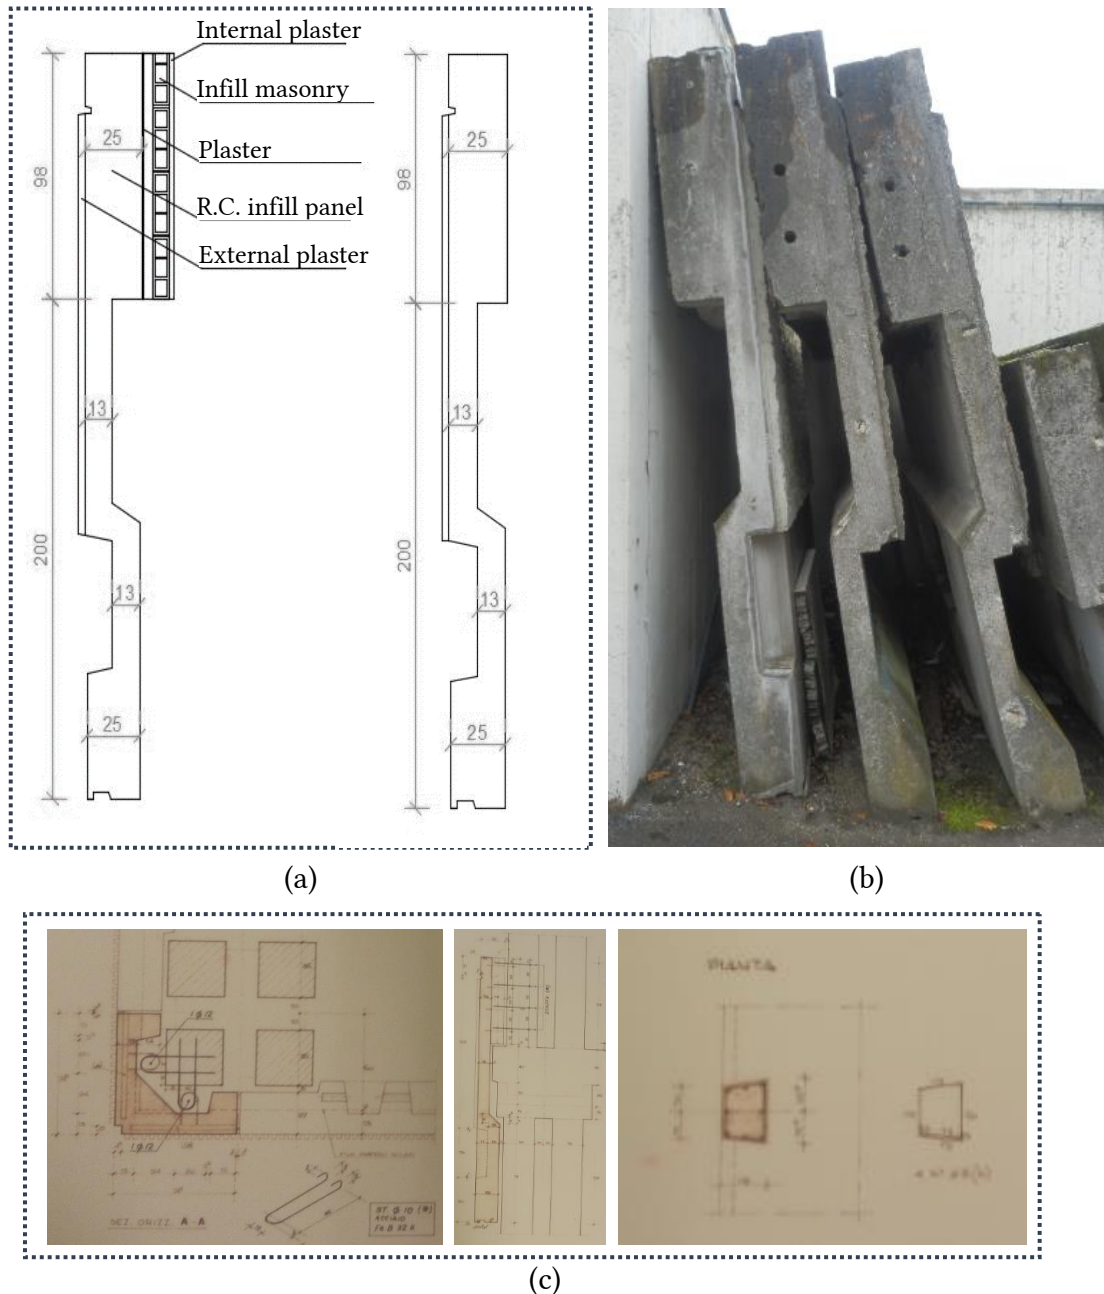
(a) External infill panel dimensions; (b) photo of prefabricated infill panels; (c) construction details of external infill panels from original design drawings.
